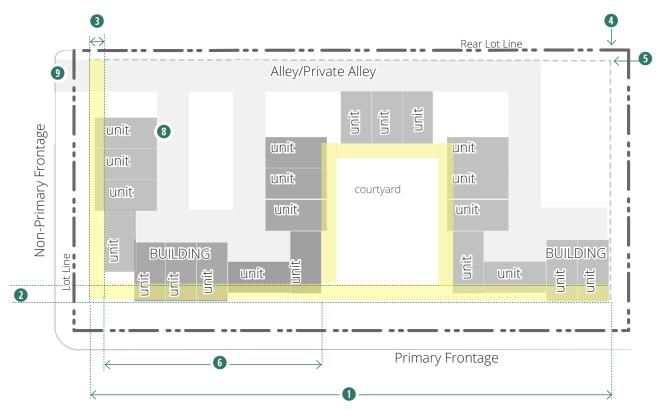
F-5. Row Building: Courtyard Layout Example
